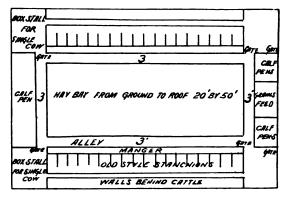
A CORNBELT BARN (GROUND PLAN).
